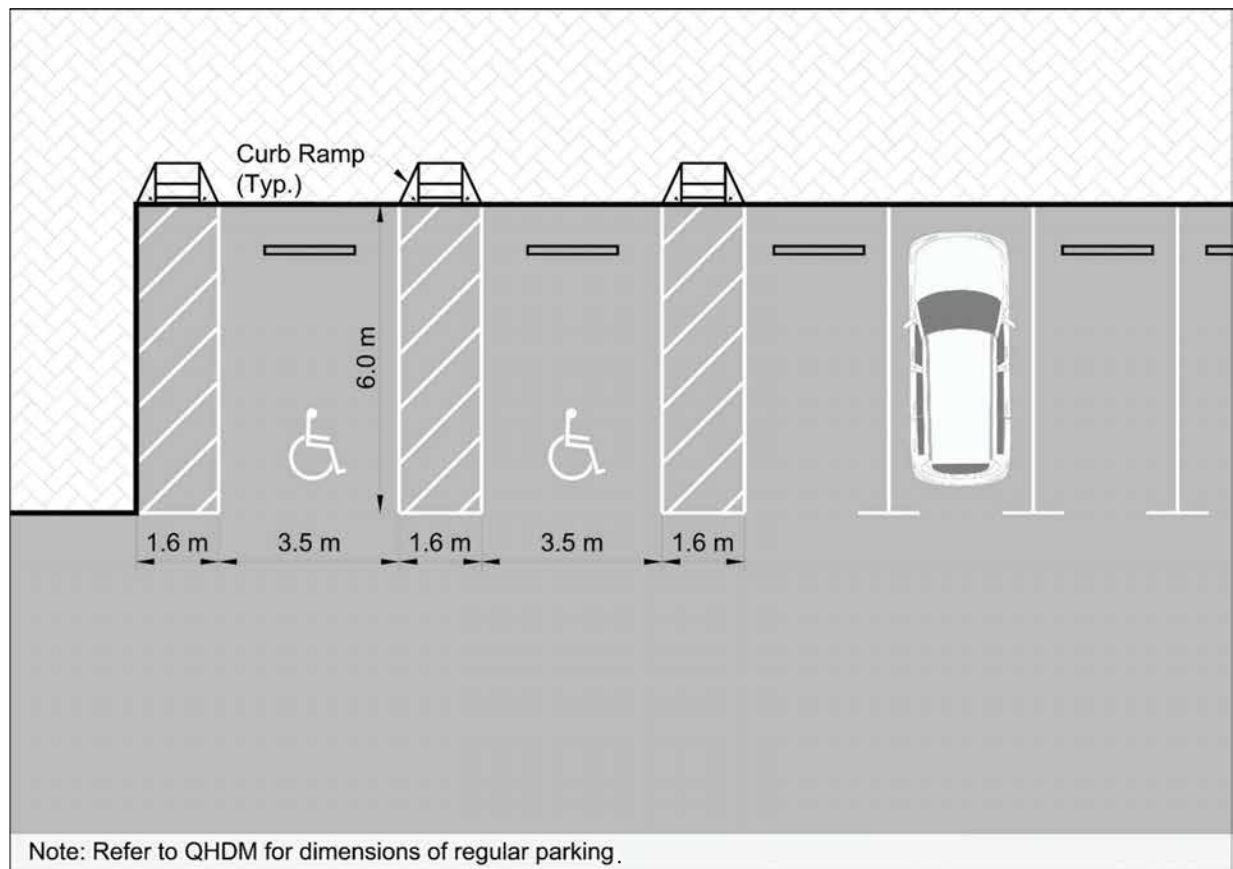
Perpendicular On-Street Accessible Parking Layout
